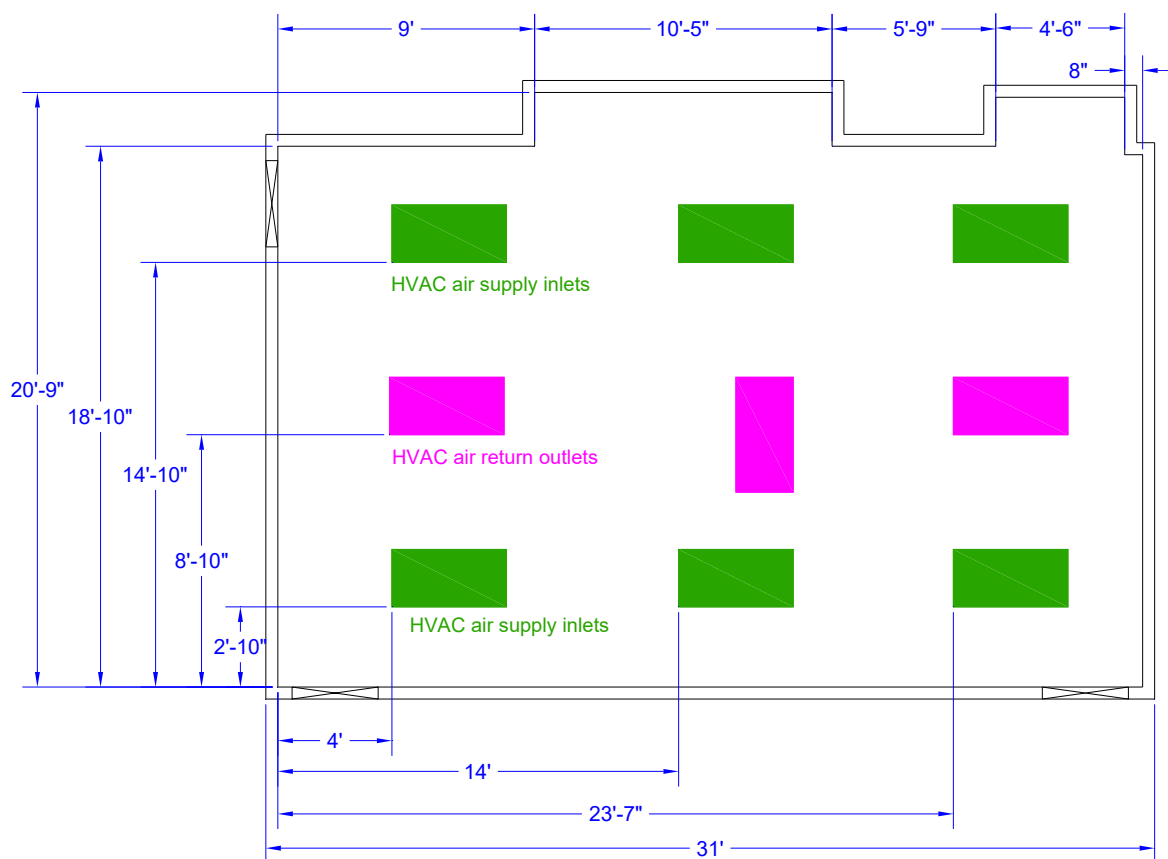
Room layout with dimensions showing HVAC system air supply (green) and return (magenta) locations in the ceiling.
